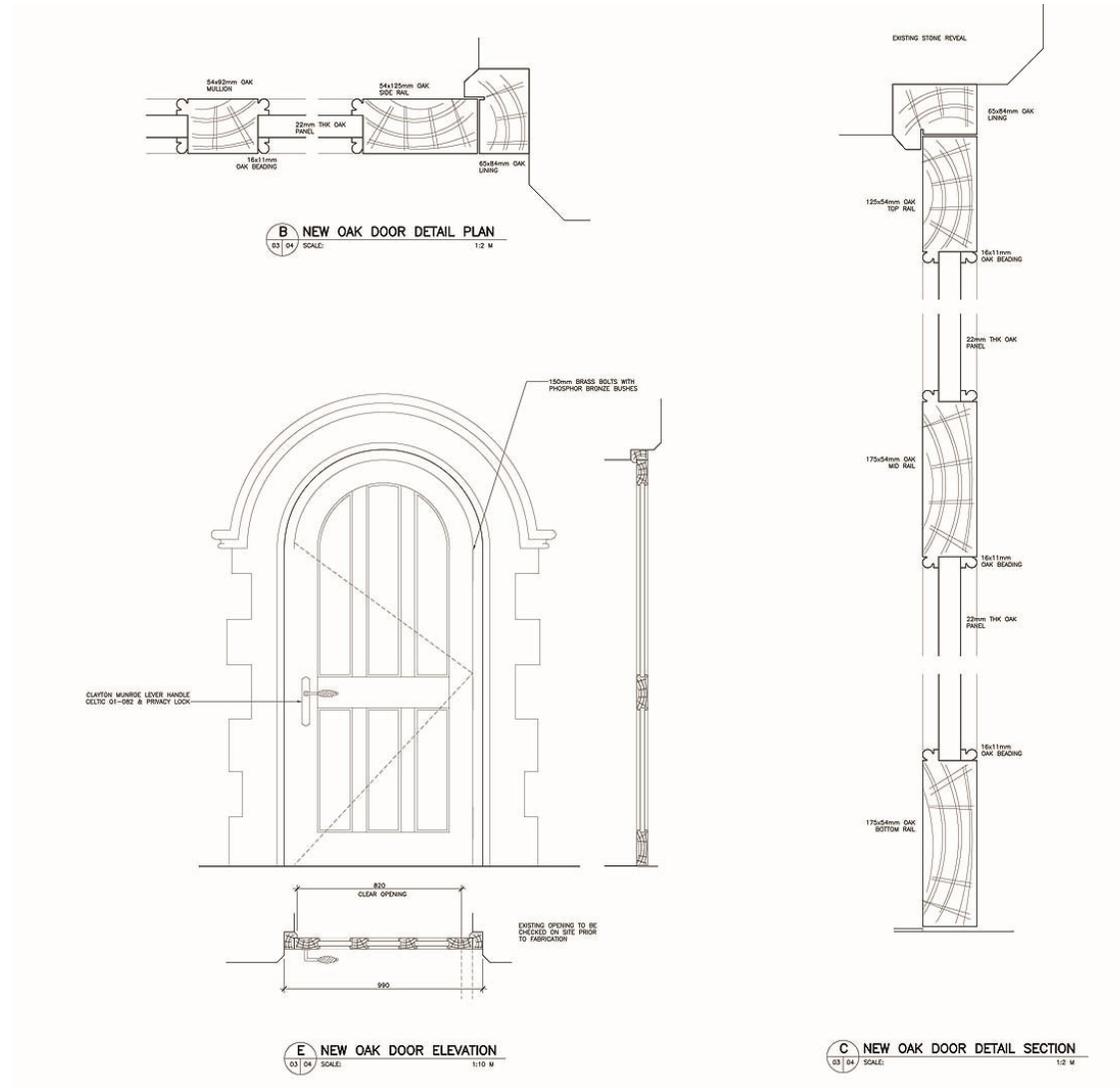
Proposed door design based on J.D.Clarke's plans drawing No.10301/04 (Rev.A).
